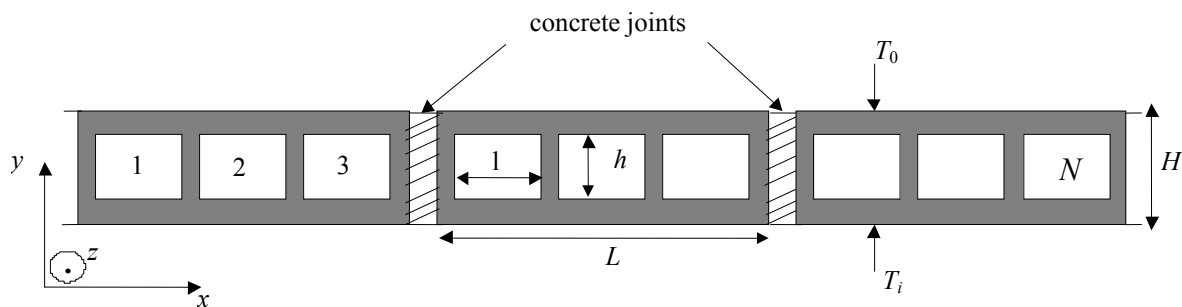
Schematic diagram of disposition of hollow blocks in building roofs
